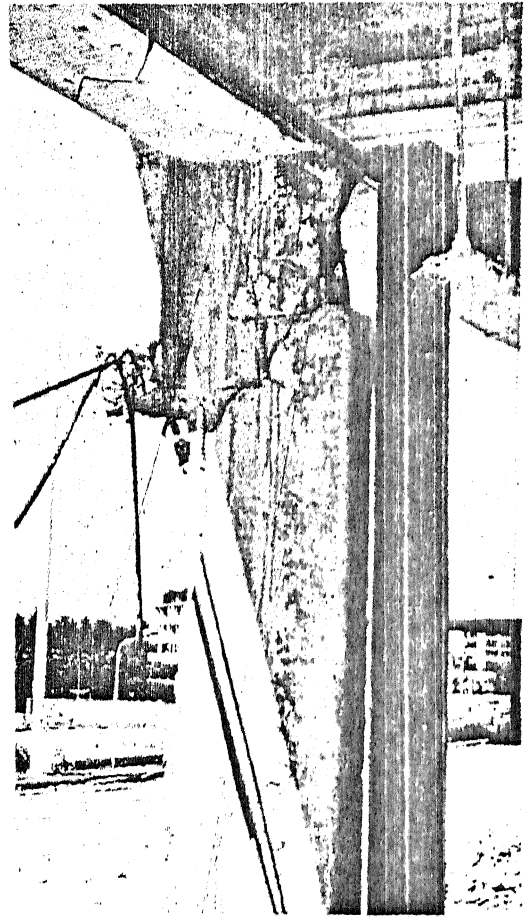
Pounding Damage at Column, Macuto Sheraton
